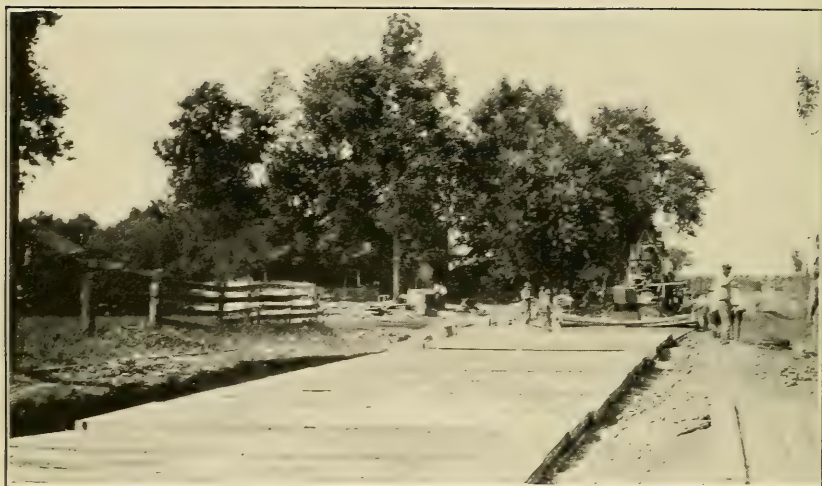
PROTECTING NEWLY LAID CONCRETE WITH CANVAS STRETCHED ON WOODEN FRAMES.
